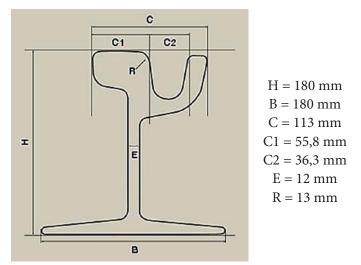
Shape and primary dimensions of a cross-section of the 60R2 dock rail [12]
